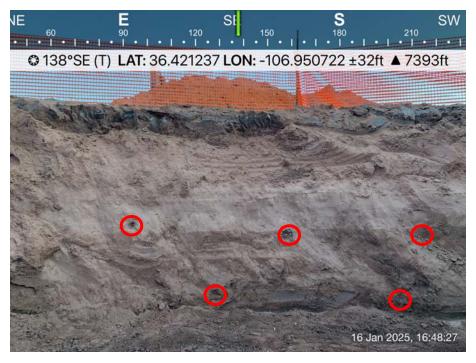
SS06 collected as a five-point composite sample 4-10 ft bgs from southeast sidewall of excavation.
